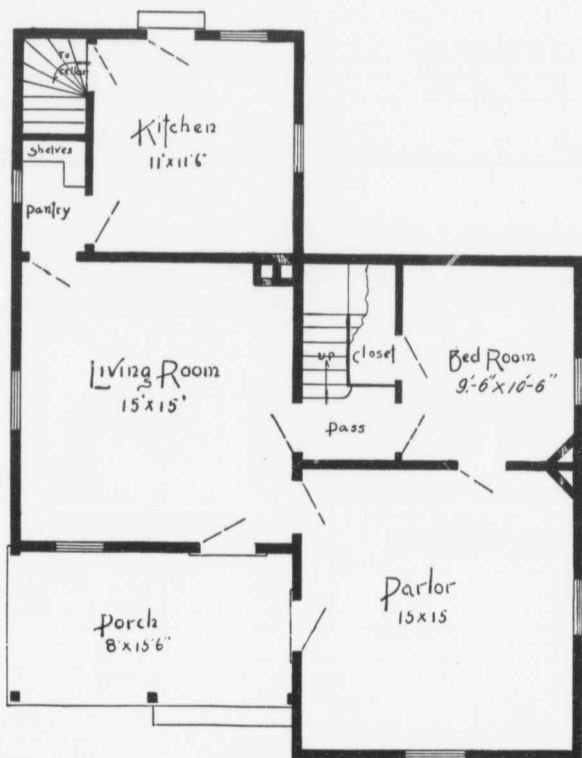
First floor of \$800 farm house with \$500 addition. (Design No. 1.)
